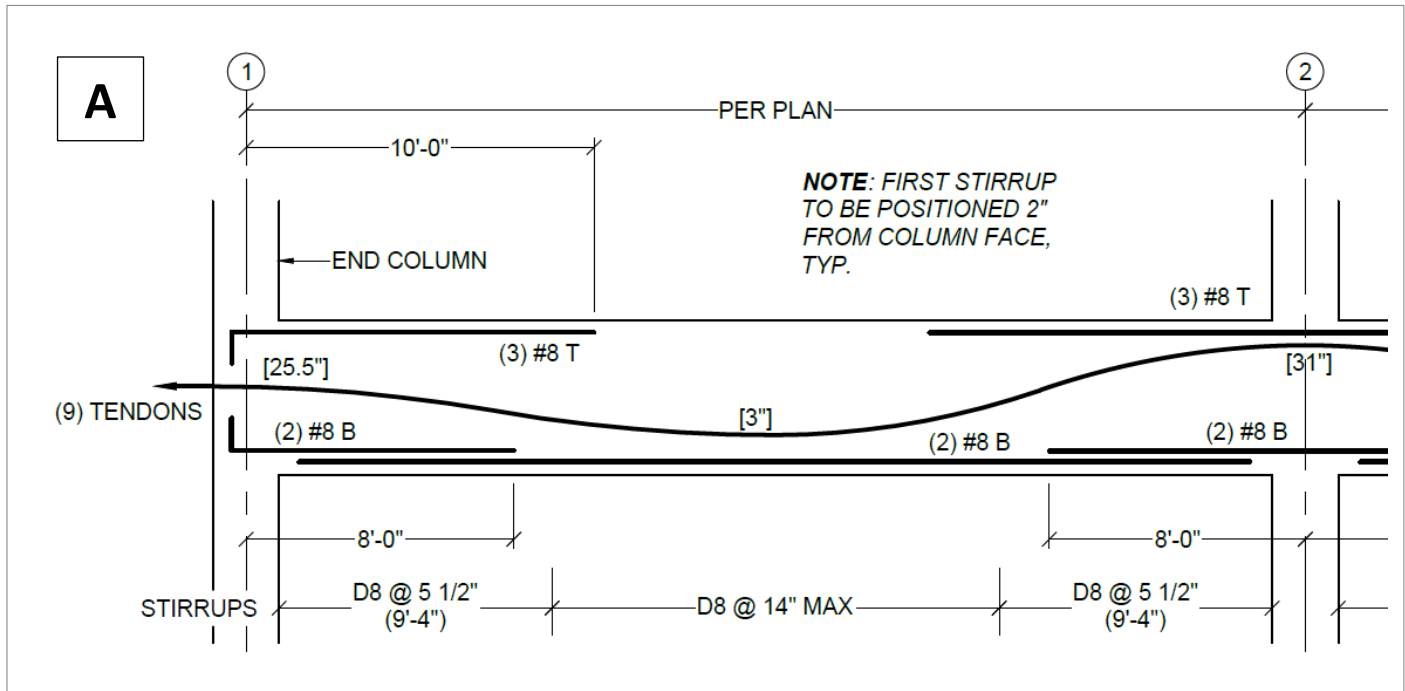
The engineer's contract drawings indicate deformed wire as an acceptable transverse reinforcement solution for a post-tensioned gravity beam.
